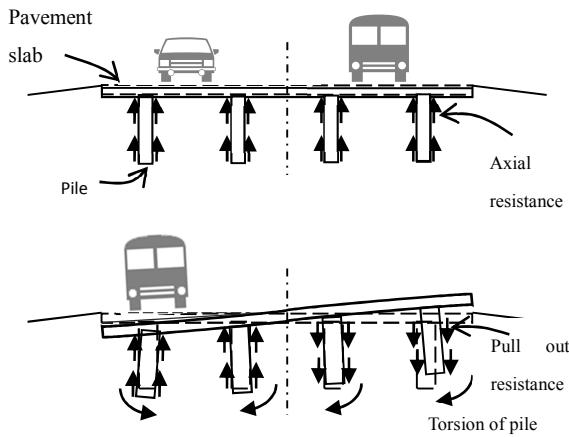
The illustration of effect of installed pile as “nail” on concrete pavement; a) axial resistance of piles, b) anchorage resistance of piles [3].
